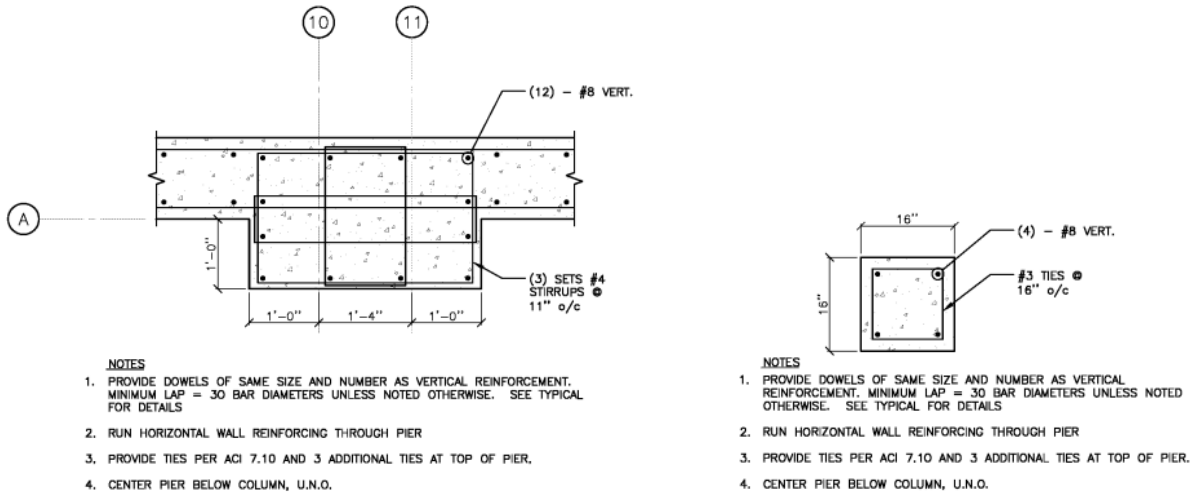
Concrete Piers (S12.02 Drawing 2 and 19)
